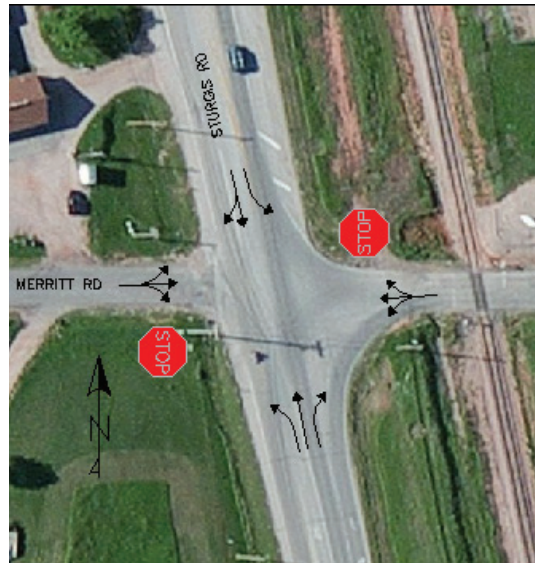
Sturgis Road & Merritt Road Intersection Configuration
